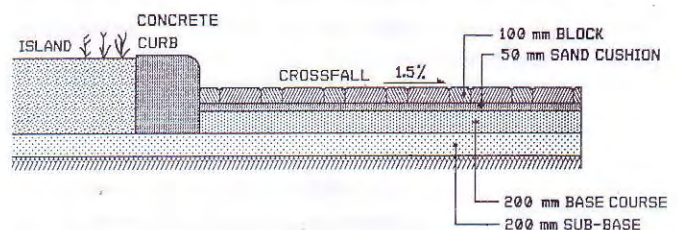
Concrete Blocks Abutting Concrete Raised Curb
